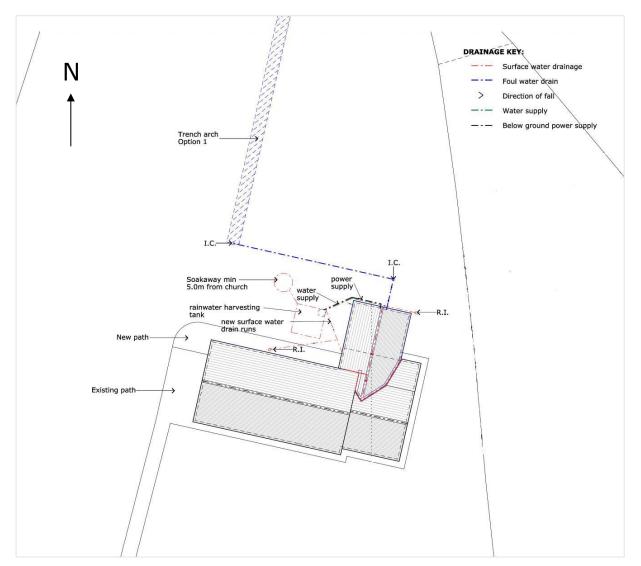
Plan of proposed church extension and associated drainage facilities. Plan supplied by client.
